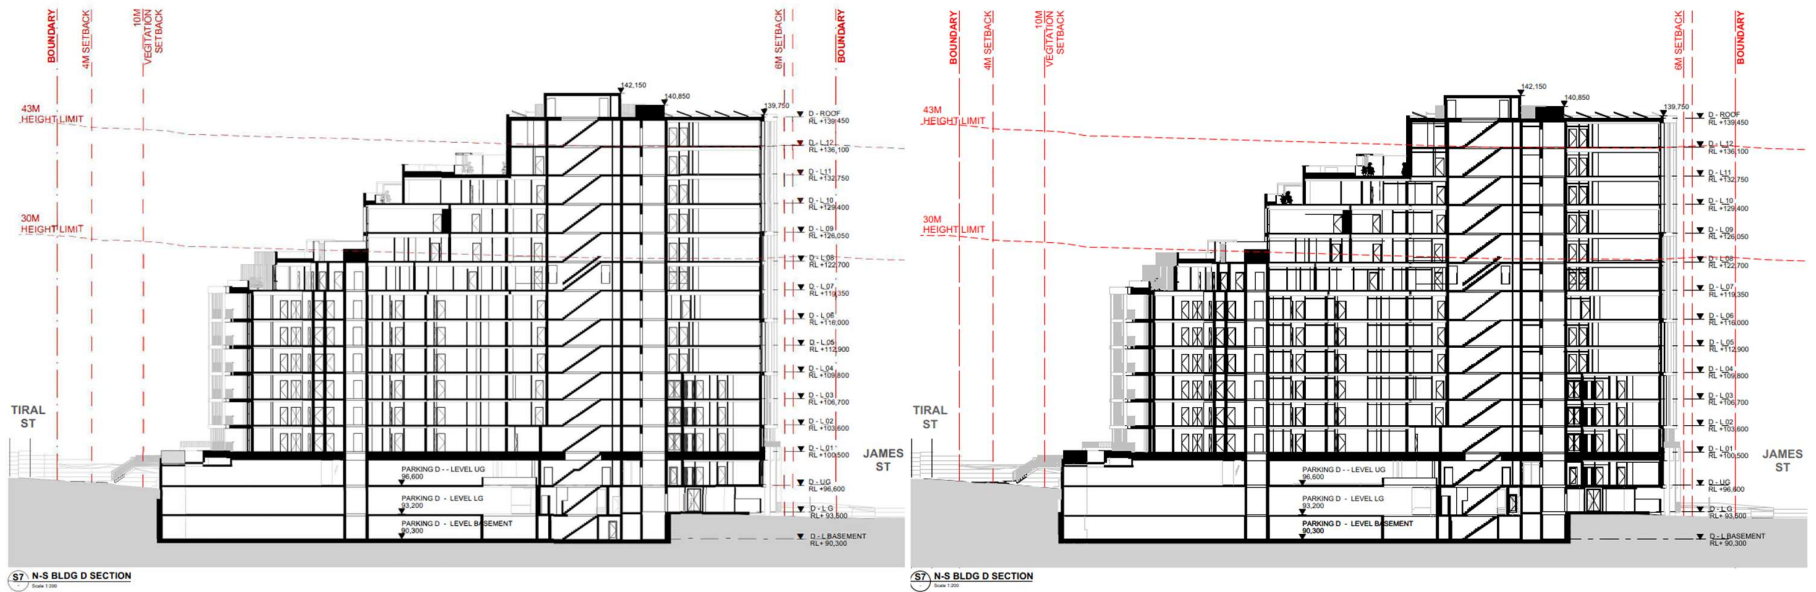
Approved and Proposed N-S Section of Building D (1 of 2)
